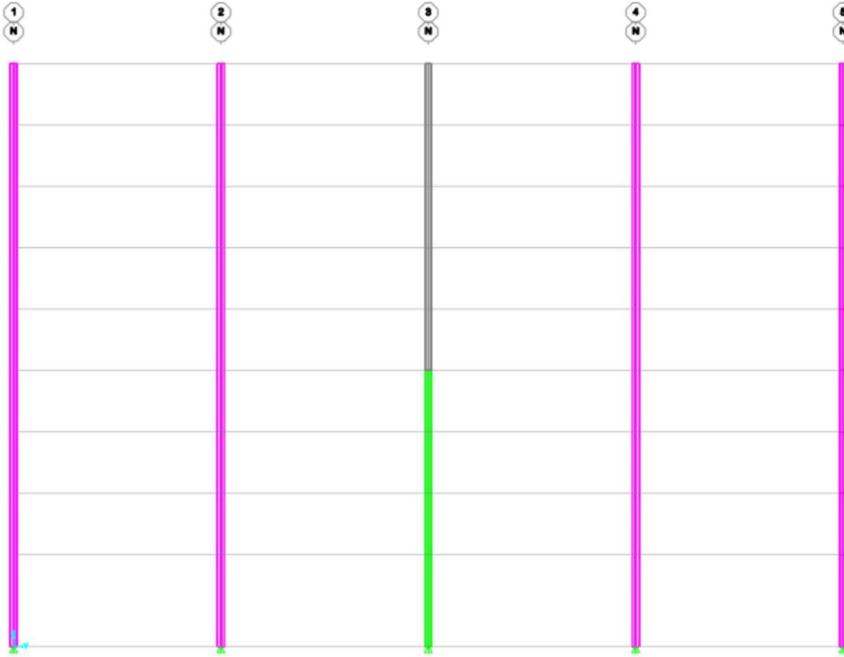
Column cross-section layout in the face H (SAP2000)
